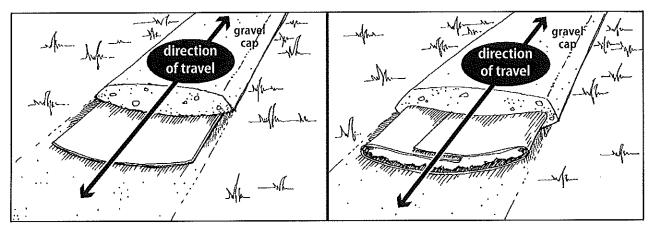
Geotextile non-wrapped (left) and wrapped (right) sections
